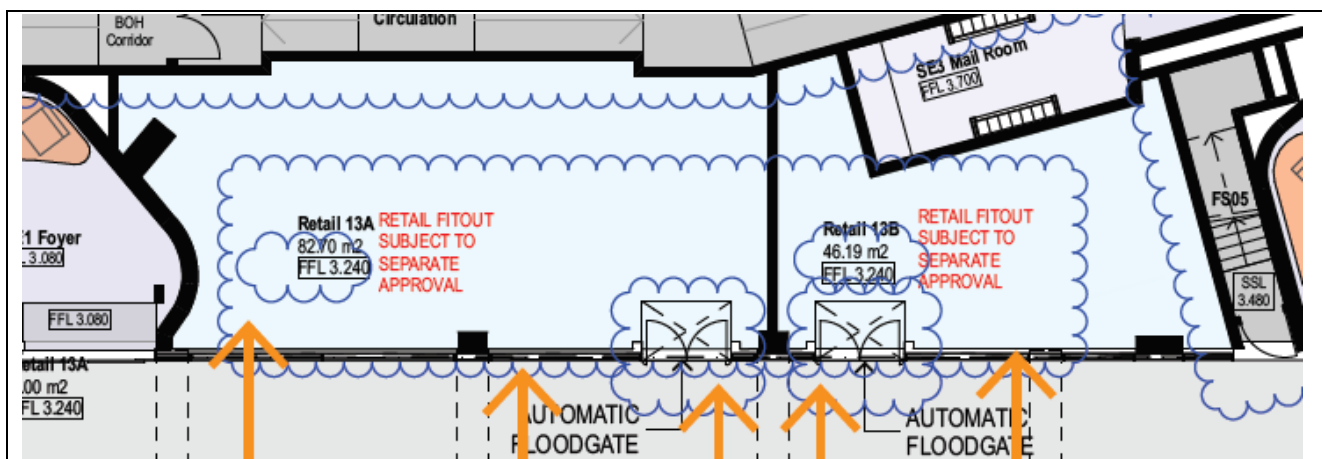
Proposed retail areas 13A and 13B (shaded light blue). Source: Applicant's Architectural Design Report
